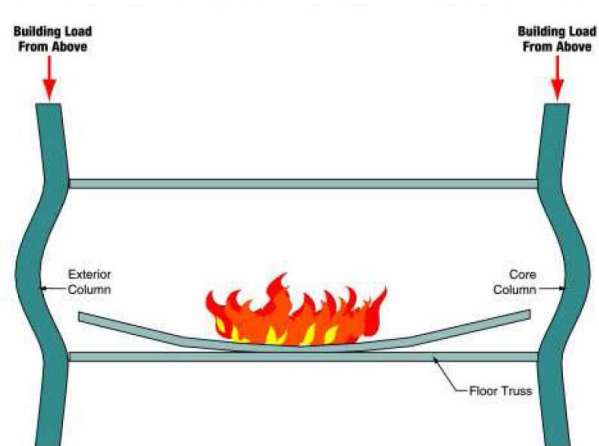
Buckling of columns initiated by failure of floor framing and connections. FEMA report 2000
